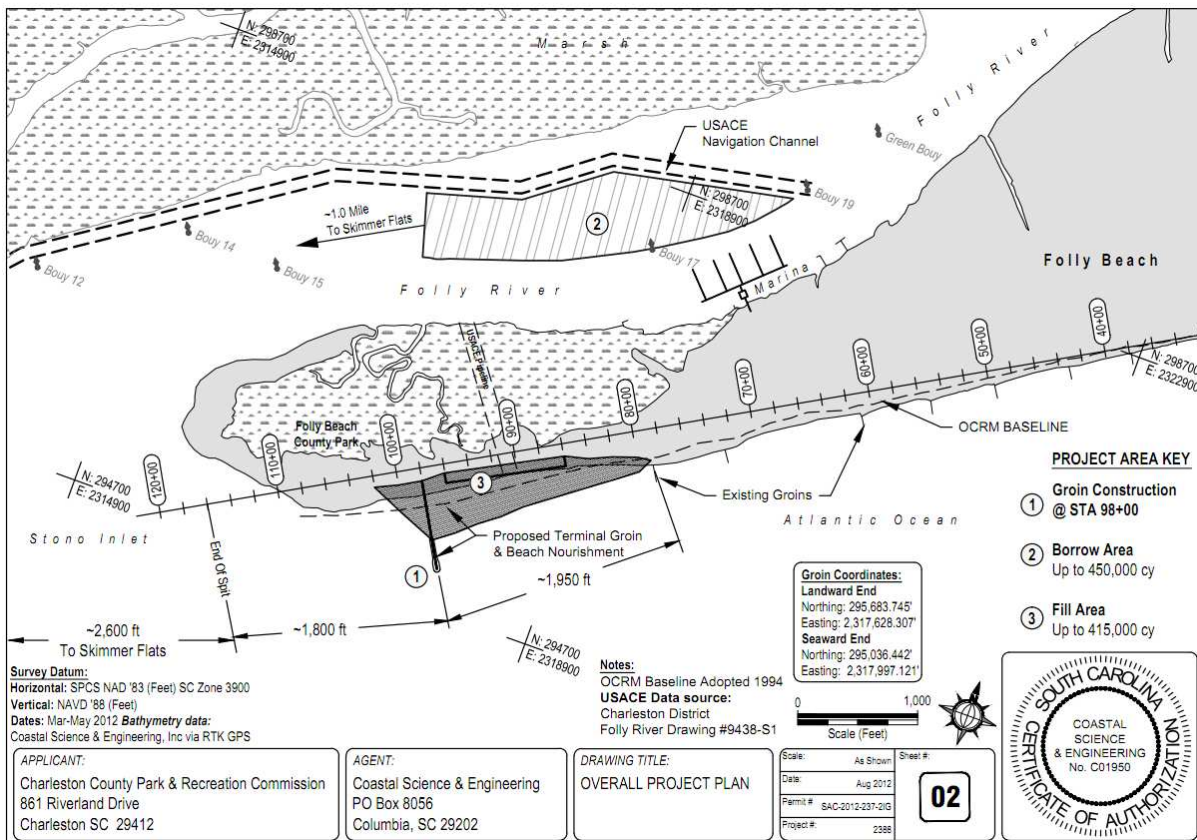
Project plan for permit application. The plan called for nourishment of up to 317,300 m³ (415,000 cy) from a borrow area spanning a mid-channel shoal in the Folly River. The limits of the borrow area were modified.
